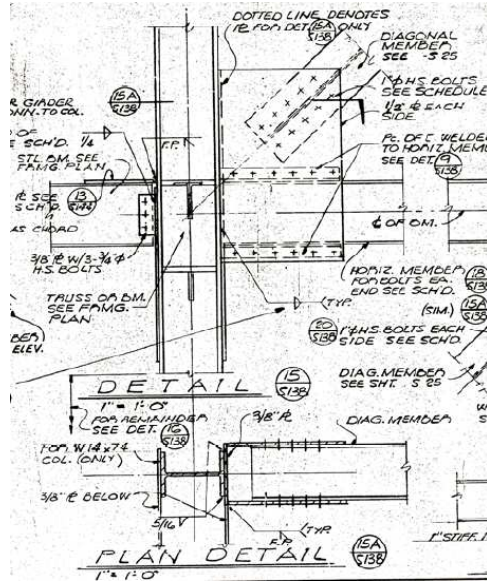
Top and Bottom Connection Detail (74CA6A--10-MN-1)
